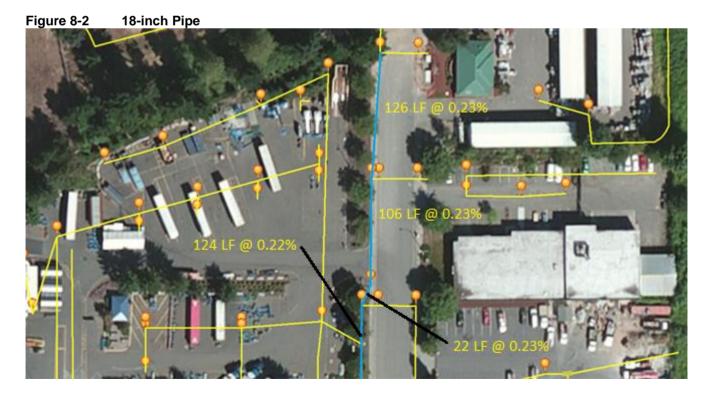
depicts the existing stormwater sewer consisting of 18-inch pipe. It appears that some onsite stormwater facilities are draining into the public storm sewer in addition to catch basins in the roadway.
